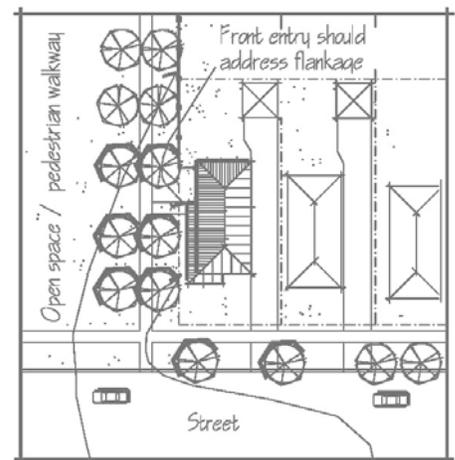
Example of Buildings Backing onto Open Space
